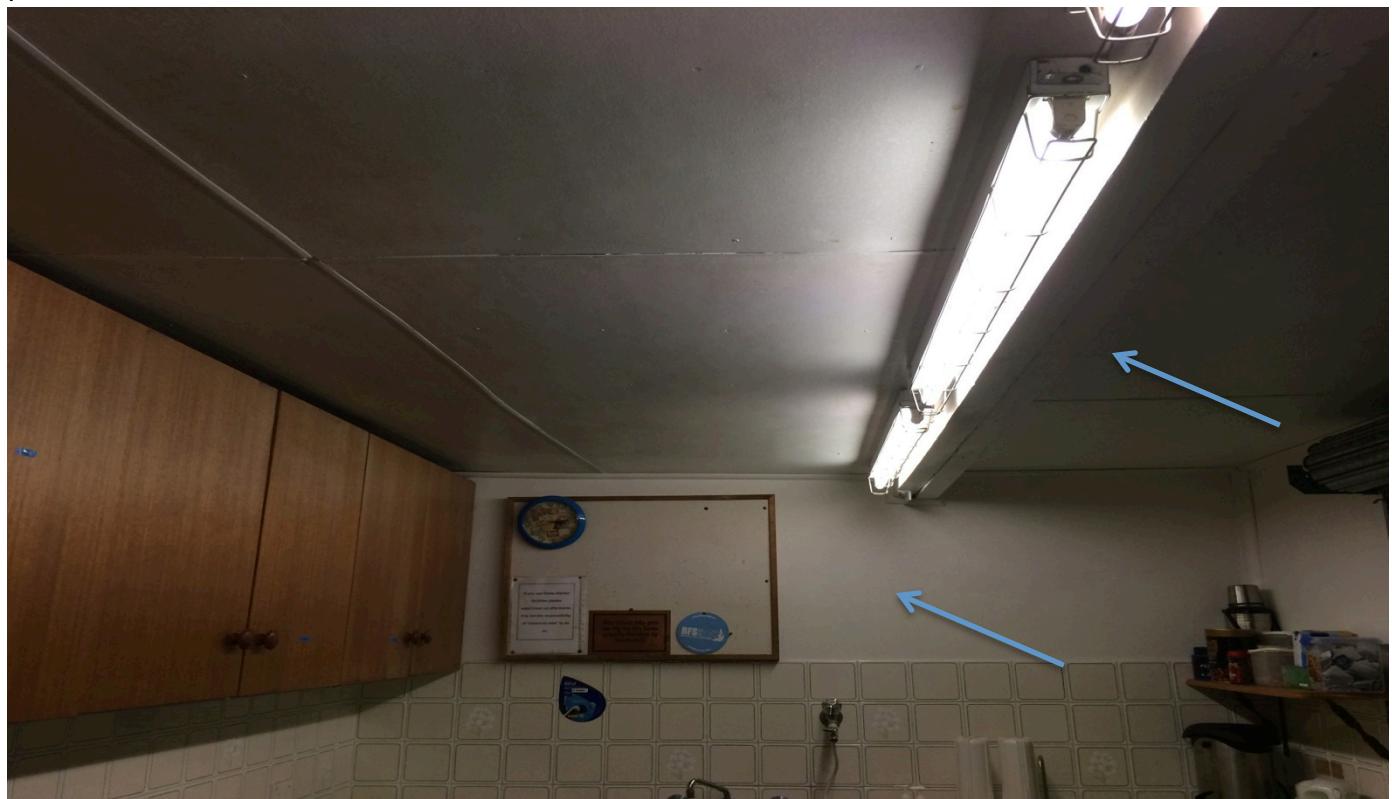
Fibreboard ceiling lining and internal wall cladding assumed to contain asbestos in the Kitchen in the western garage of the Glenbrook Rural Fire Service Bushfire Station.
